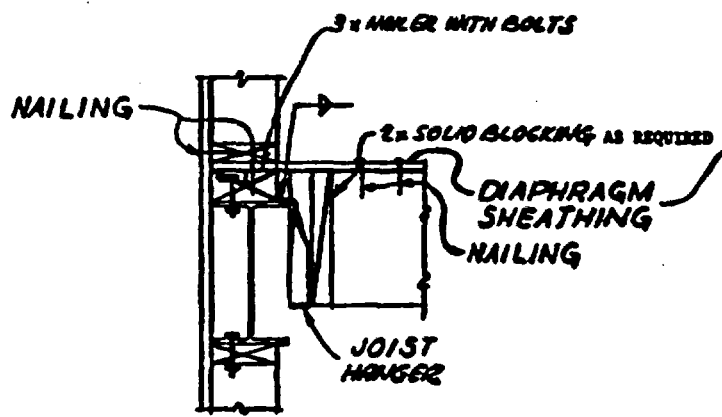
Wood Diaphragms - Typical Strut Connection Details
